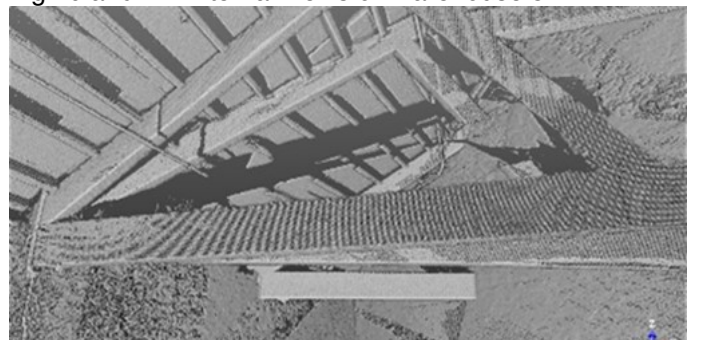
3D scan, Warehouse 5 decayed roof timbers
